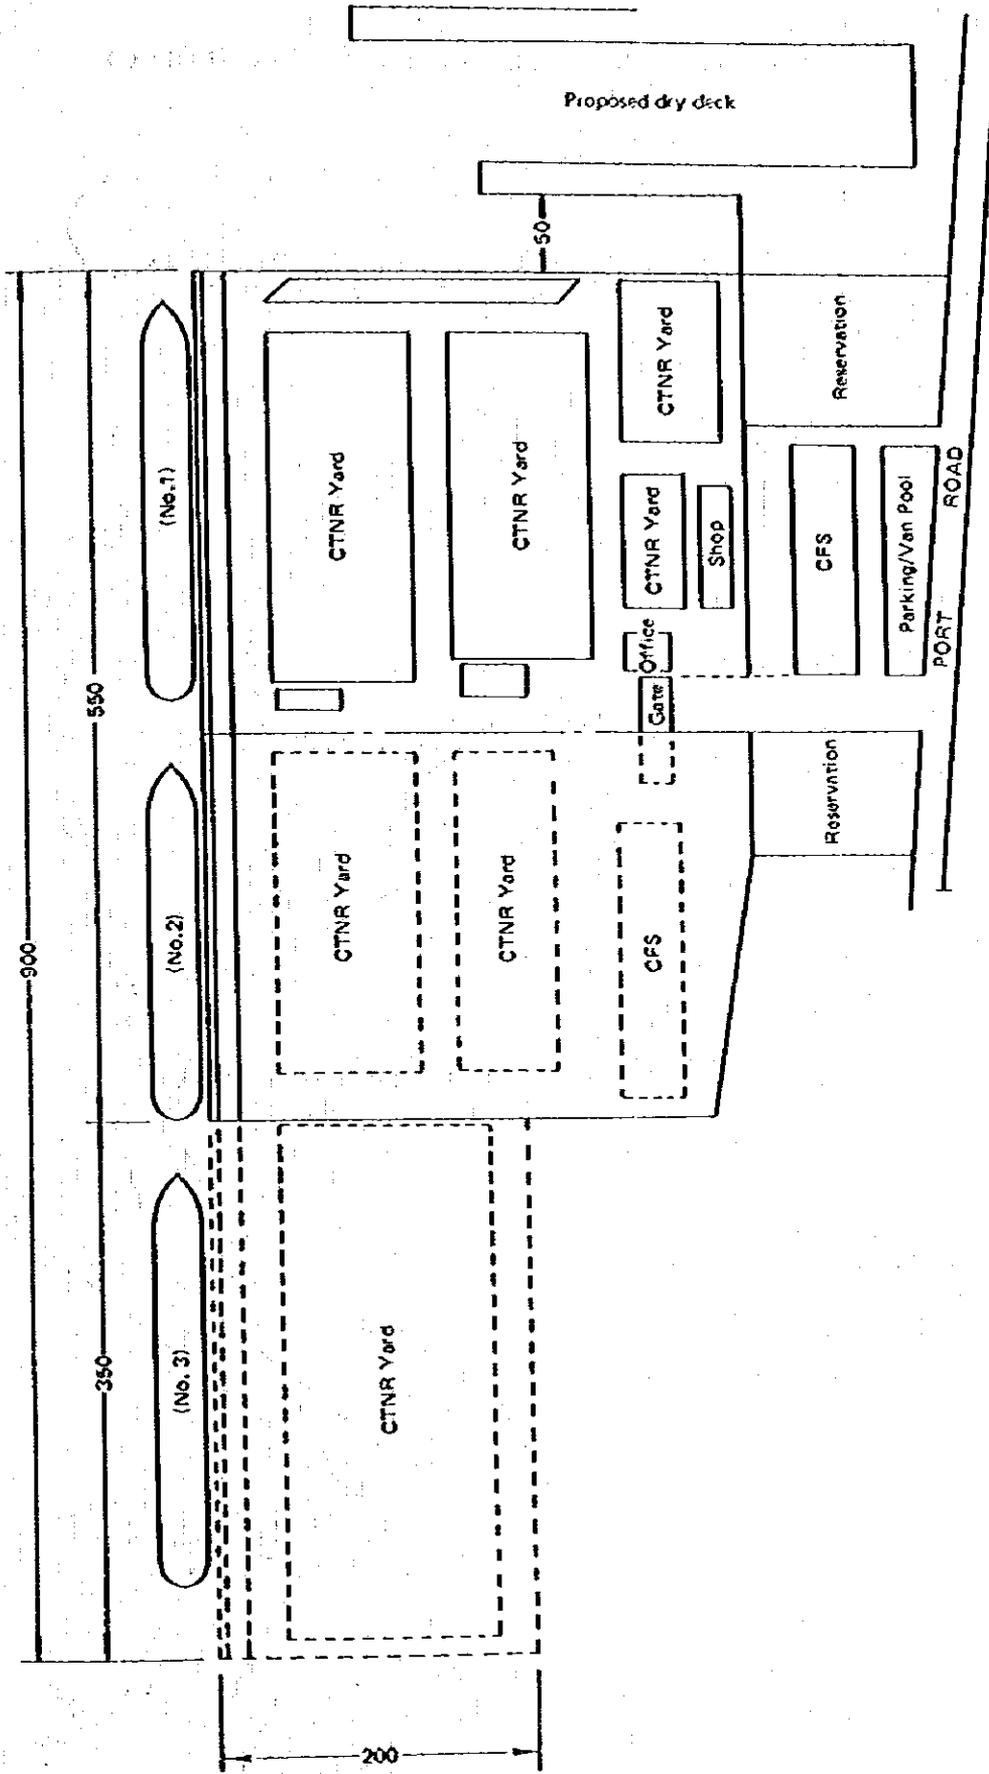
Basic Layout of Korteboom Container Quay (Master Plan)
